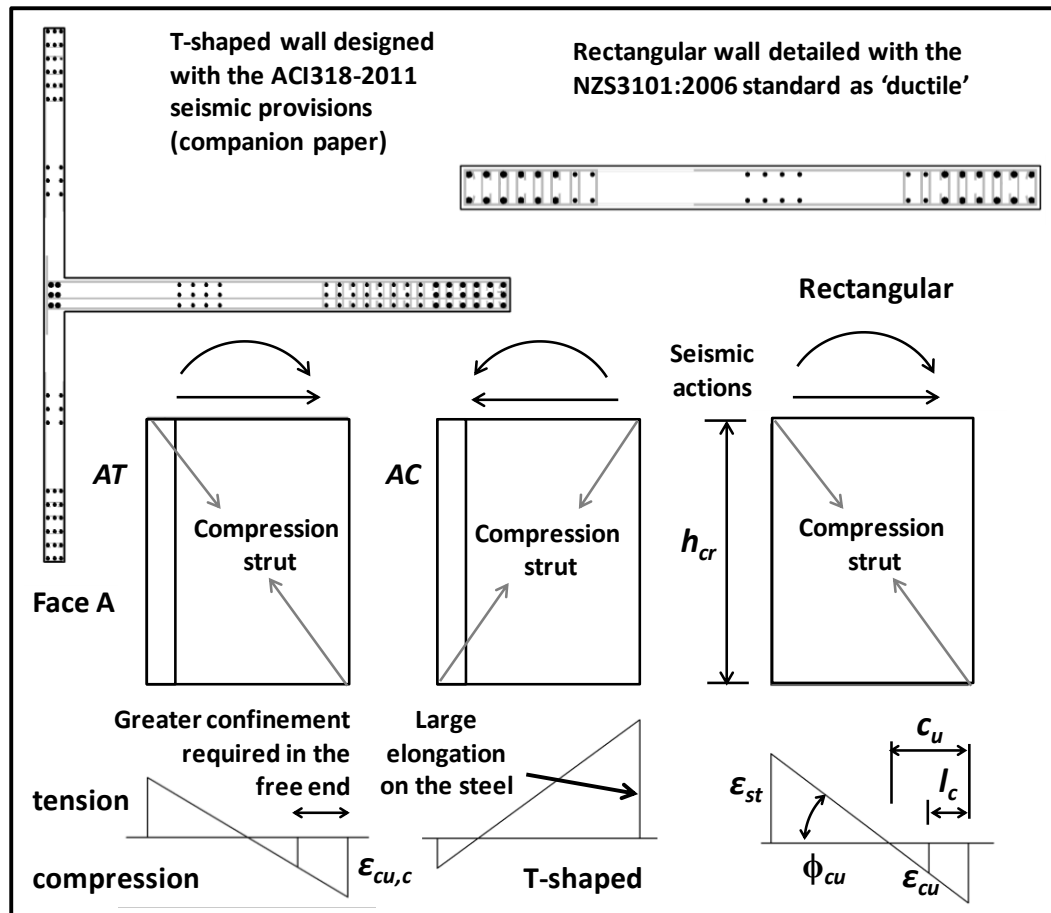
Cross section of the wall under study, plus a C-shaped wall for theoretical discussion; definition of positive and negative bending actions in the T-shaped wall.
